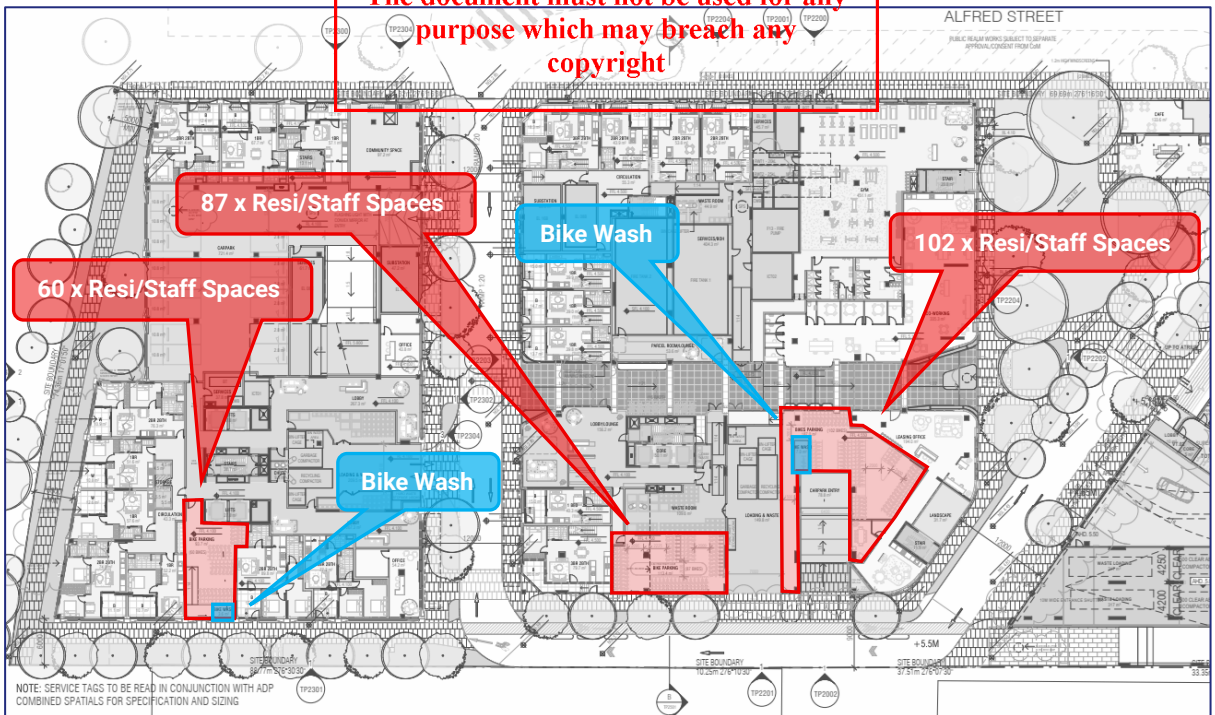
Bicycle Parking – Stage 2 and 3 Lower Ground Floor
